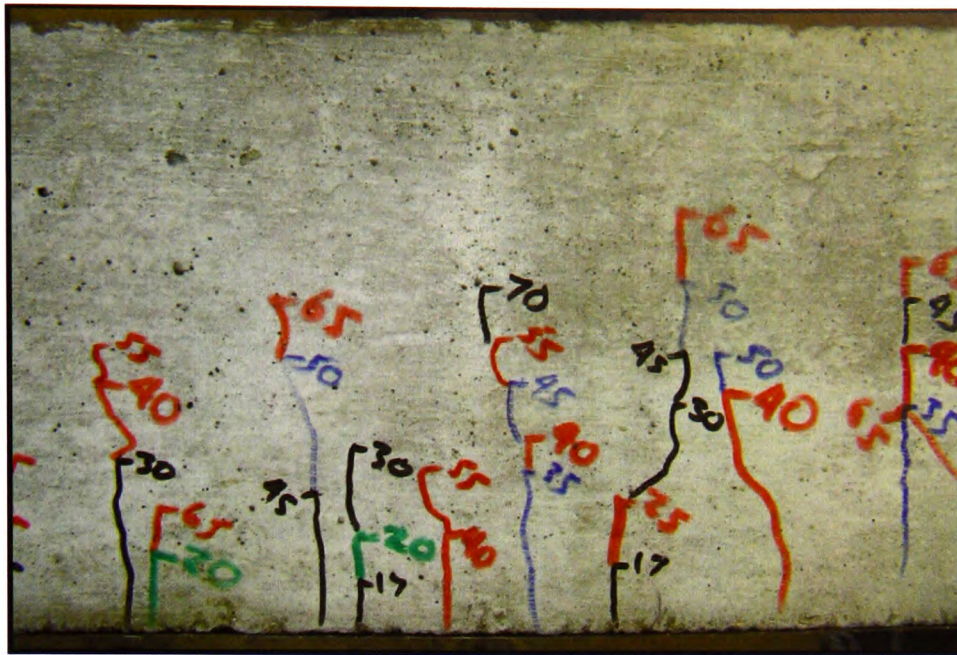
Sample photograph of crack marking with coloured markers during testing
